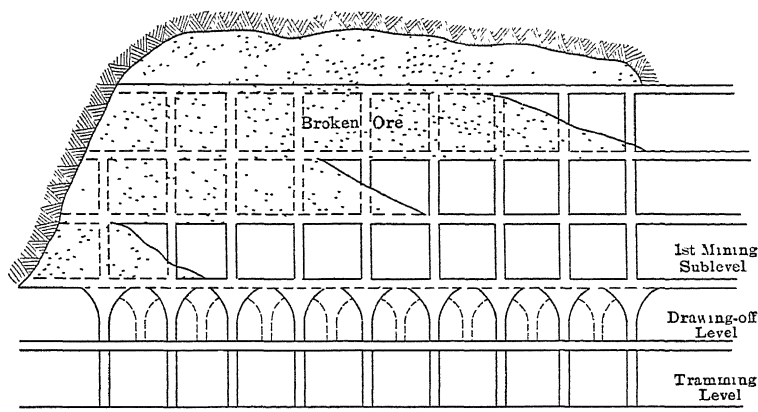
LONGITUDINAL SECTION THROUGH PILLAR, SHOWING MINING PROGRESS.
